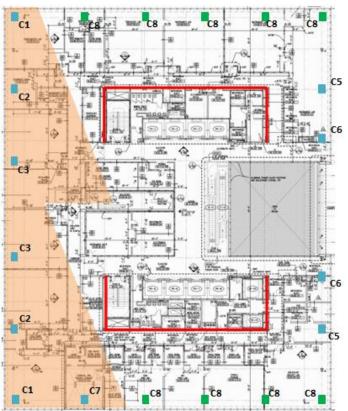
Location of New Columns (Amtrak Tracks Shown in Orange)
